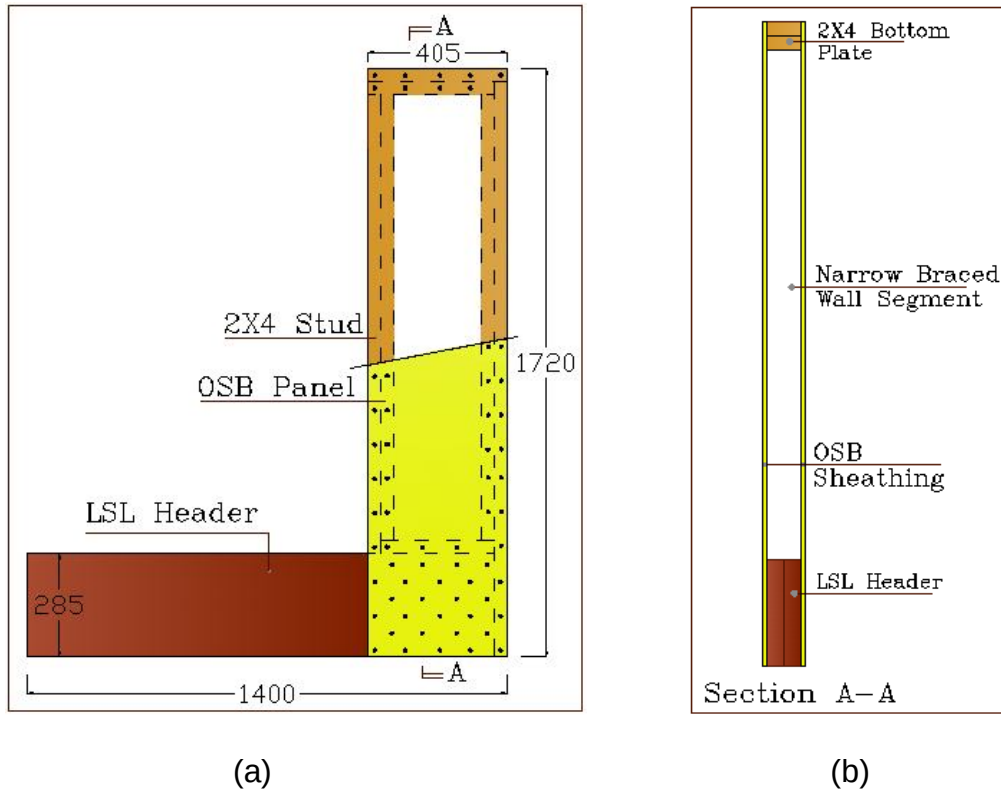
(a) Elevation and (b) cross section of standard portal frame corner joint (dimensions are in mm)
